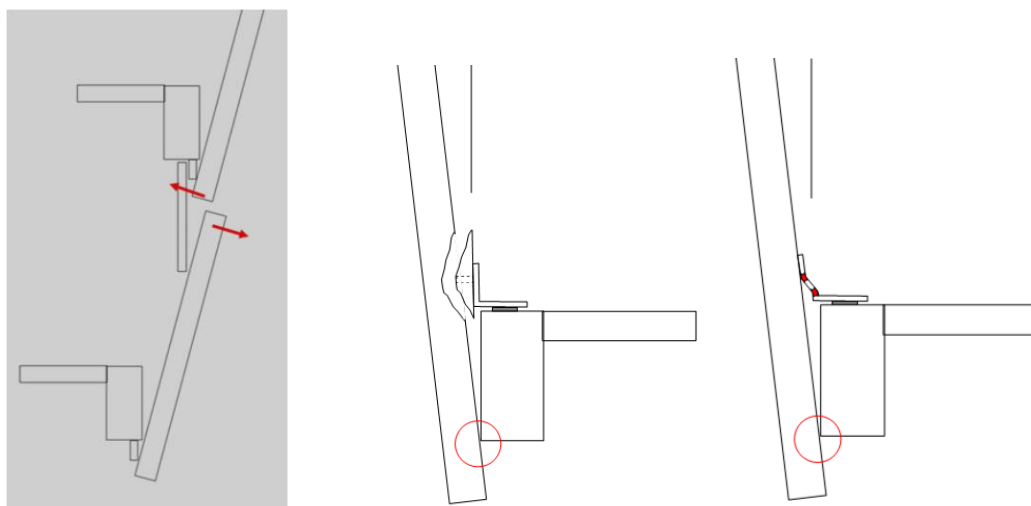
Potential precast panel prying failure modes (left) out-of-plane clash with bottom and top of panels, (middle) panels hitting the supporting beam causing concrete cone pull-out, (right) panels hitting the supporting beam causing yielding bracket
